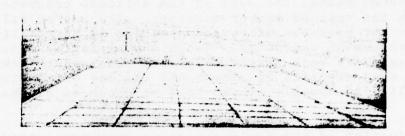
Prefabricated pavement made of silicate-concrete slabs on the Omsk&Sherbakul road.
